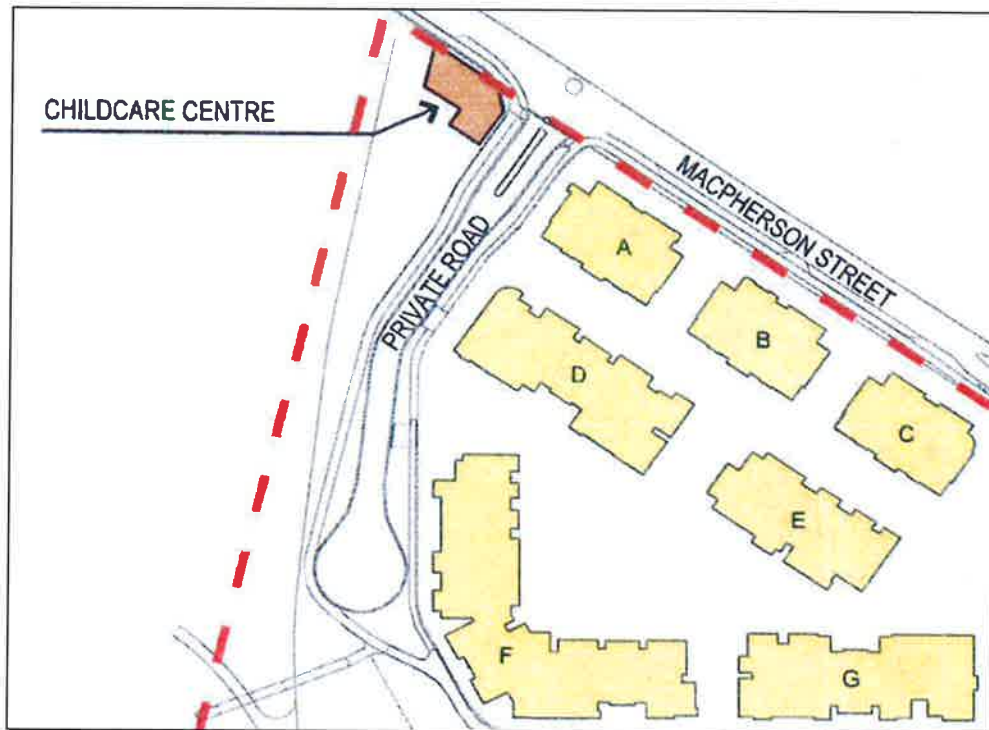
Approved Concept Plan land use plan illustrating the childcare centre location
